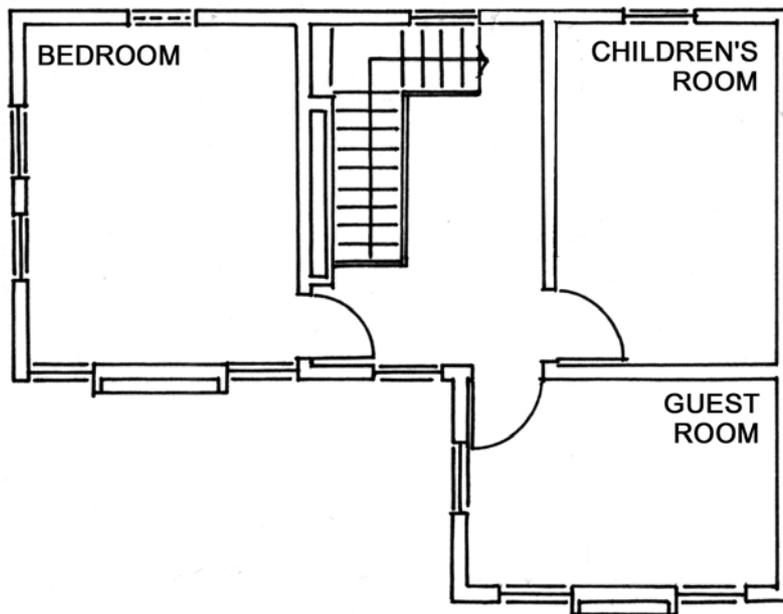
Plan of type S₃ dwelling (house with depot on the ground floor); Scale 1/100
